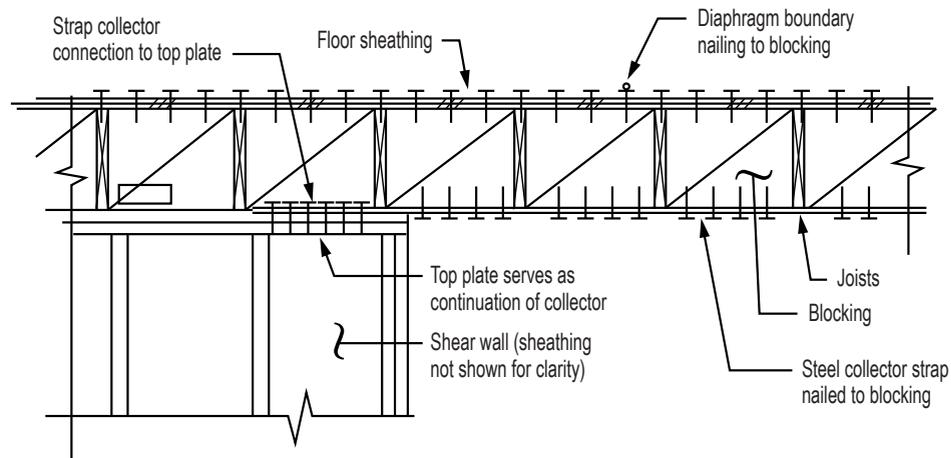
Steel strap and blocking providing a boundary member perpendicular to framing direction.
